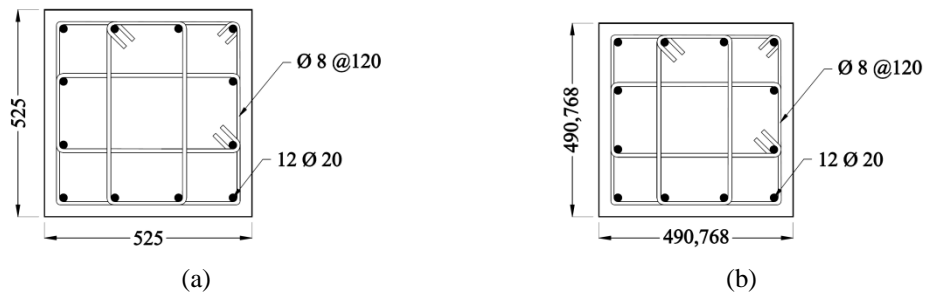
Columns cross-section details of the Modified 1 case of structure with eccentricity ratio equal to 0.026 (a) C1 and (b) C2, C3, C4 (all dimensions are in millimetres).
